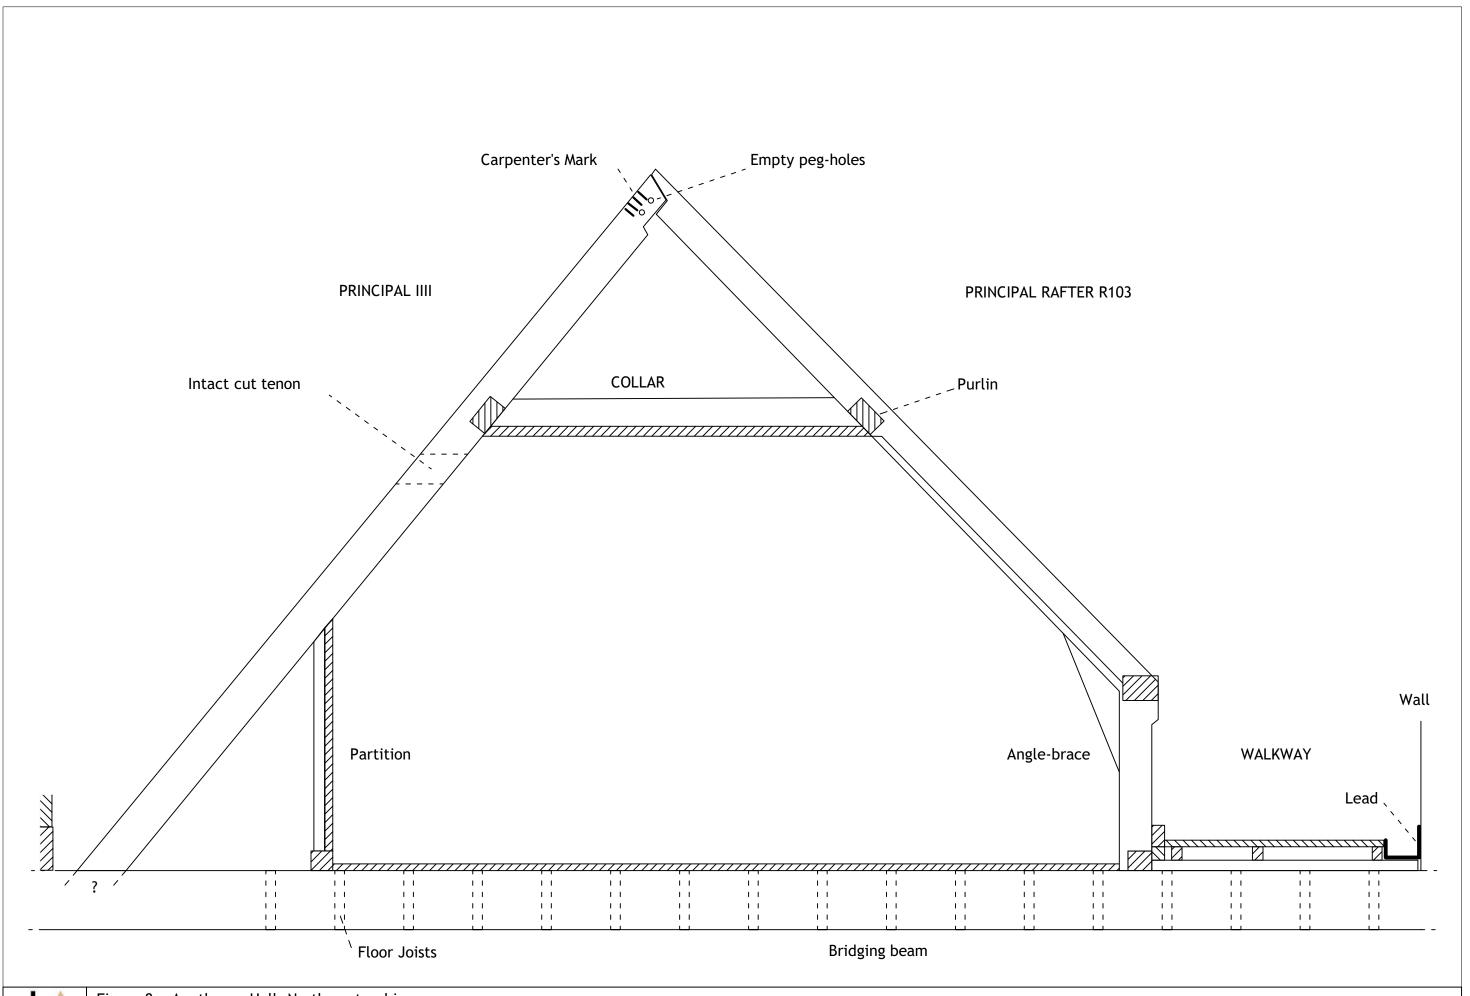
Apethorpe Hall, Northamptonshire Cross-section of Truss IIII 1:20 at A3 RS/DW 26/09/07
